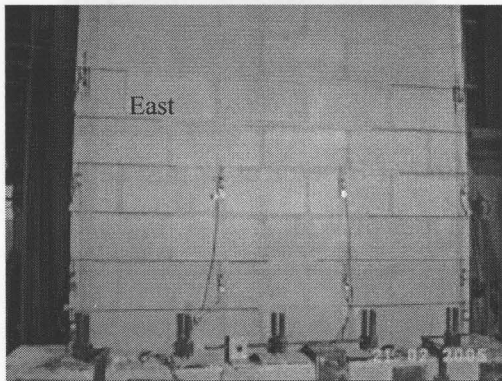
13: Horizontal cracks corresponding to 6 mm top deflection (Wall 2)
